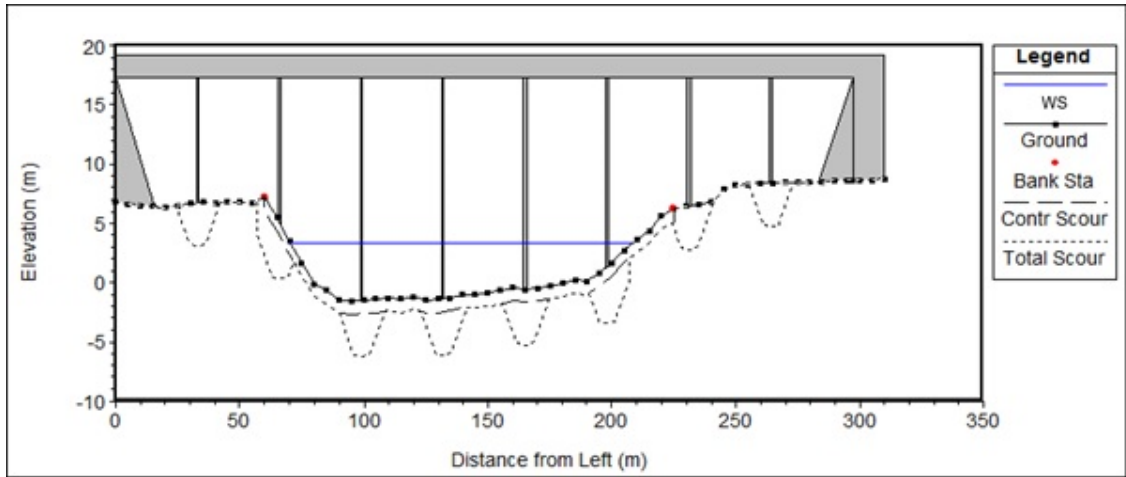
Variation of pier scour at the Manikganj Sadar Bridge under design condition with HEC-RAS model [the maximum local scour is found to be 3.63 m, with 1.5 m pier width, 24 June]
